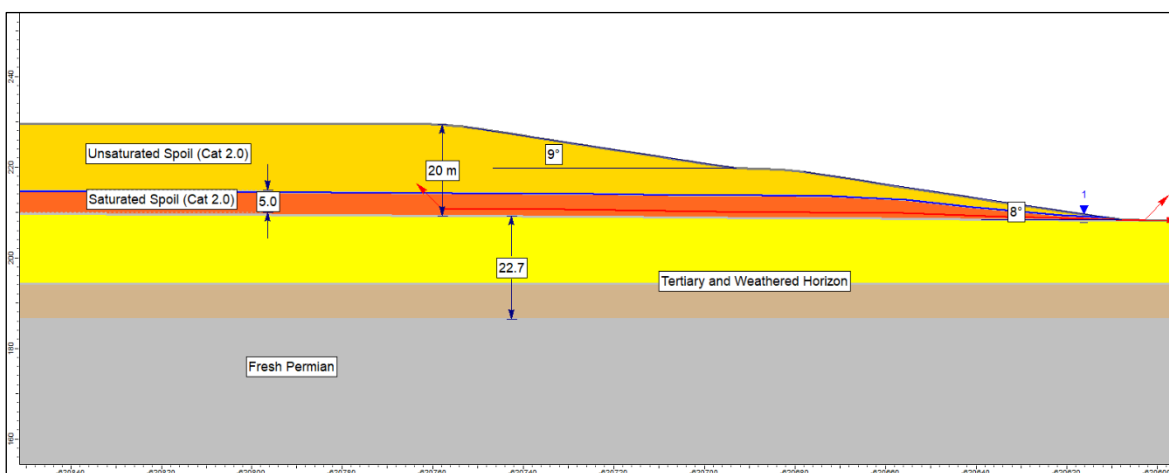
Northern Ex-Pit Spoil Dump - Section 6 (South Facing)
